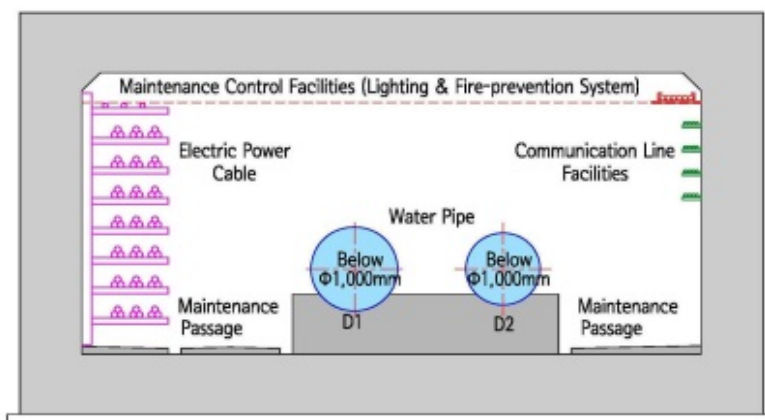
Typical section of the excavation utility tunnel (Culvert)
